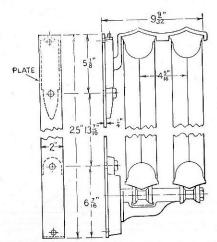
Arco Adjustable Wall Bracket, No. 2 Double. For 7-B Sections of American Peerless Wall Radiators.
